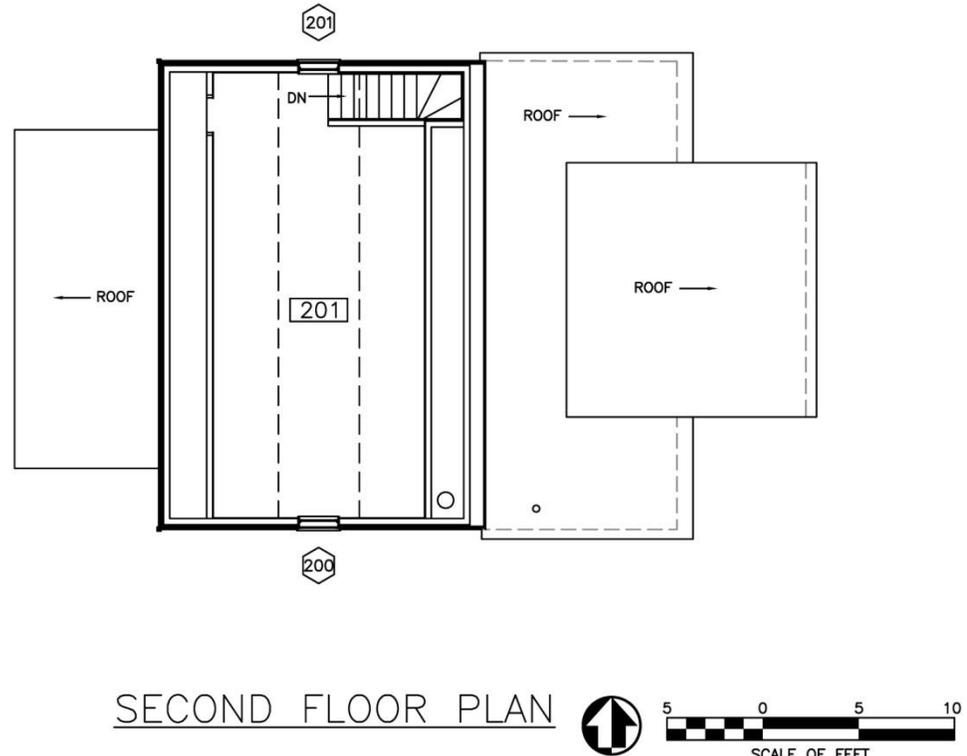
Existing Second Floor Plan. (SRJA 2012)
